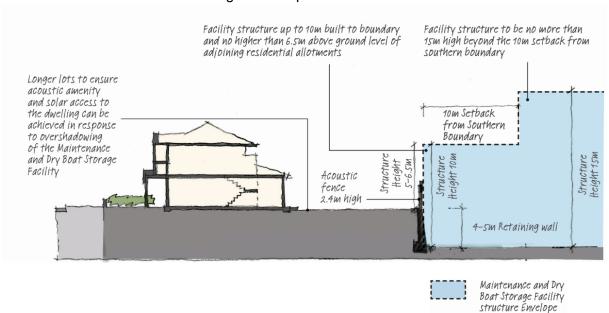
Section drawing of residential development and adjoining lot 1000 development (extract from Precinct A urban design guideline)
